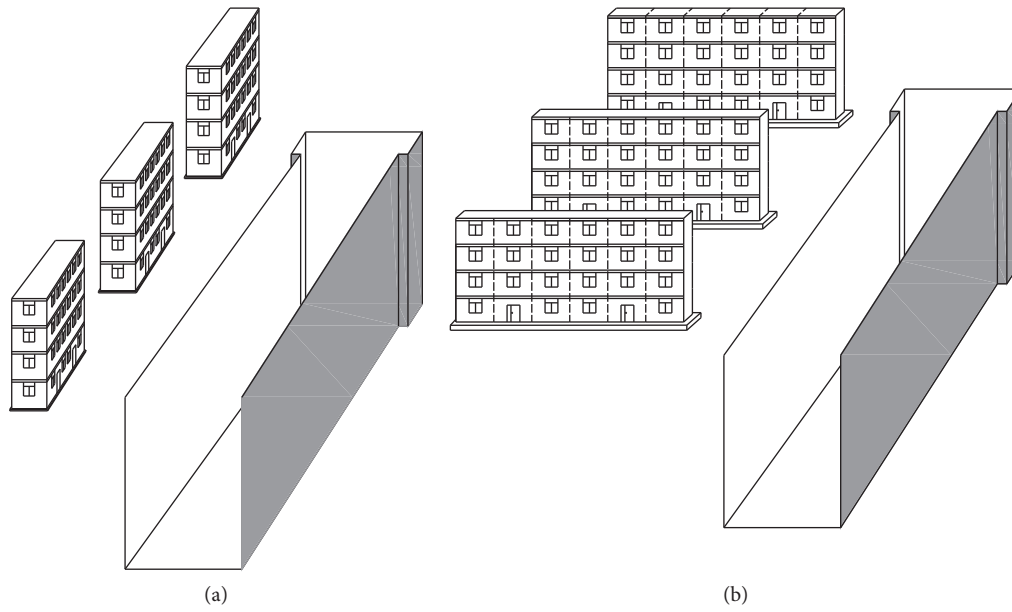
Schematic of the relative position relationship between the building and foundation pit. (a) The longitudinal walls of the building are parallel to the foundation pit. (b) The longitudinal walls of the building are perpendicular to the foundation pit.
